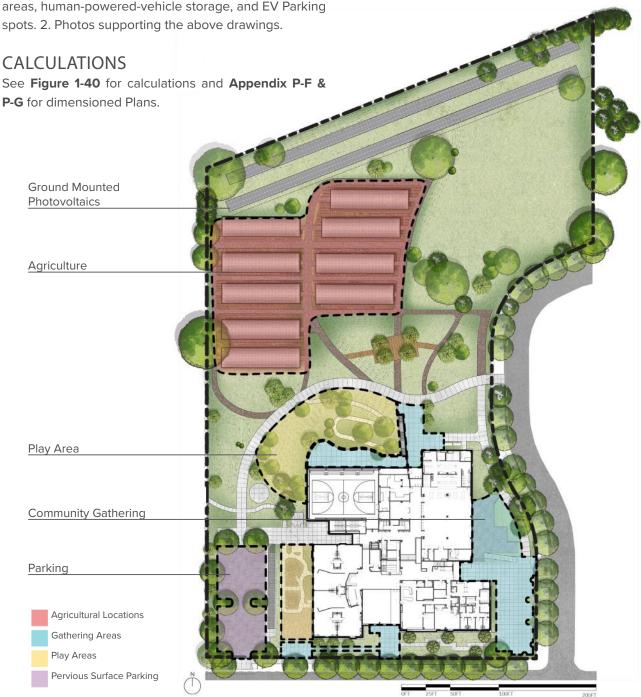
Dimensioned Plan showing the Location and Area of the Pervious Surface Parking, Gathering Areas, Bike Storage, and EV Parking Spots.
